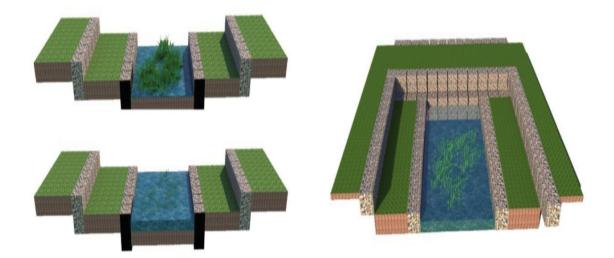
Design layout and sketches presented to Campus Planning to further develop the concept plan.
